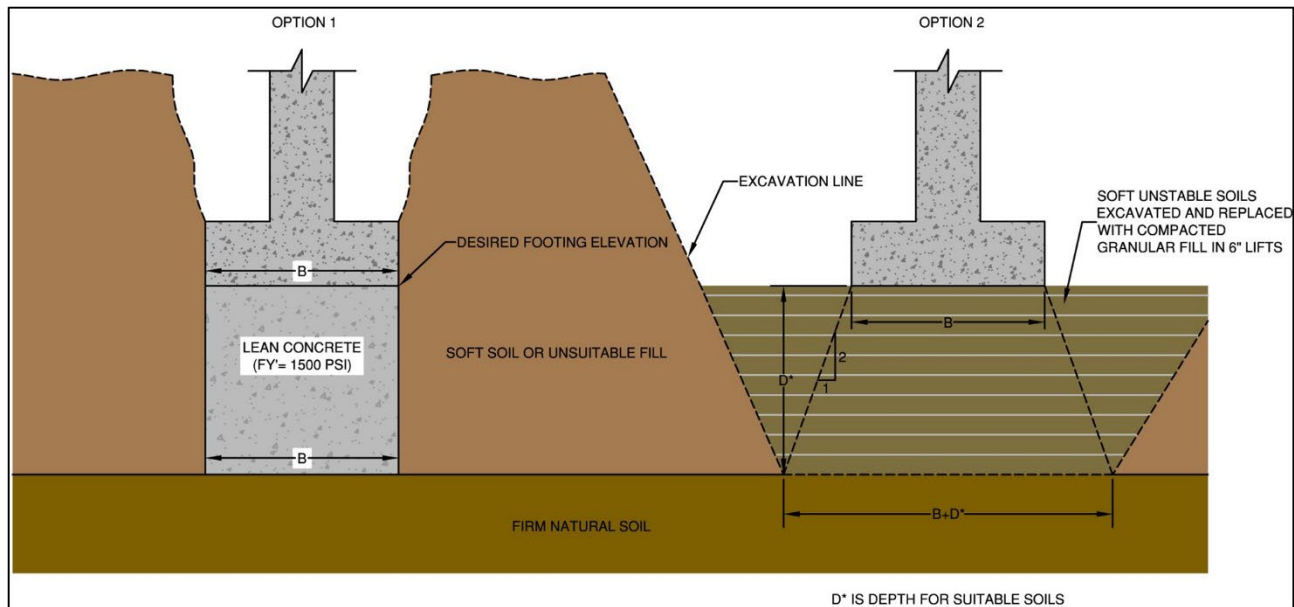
Example of Undercut Soils Replaced with Lean Concrete or Suitable Structural Fill
